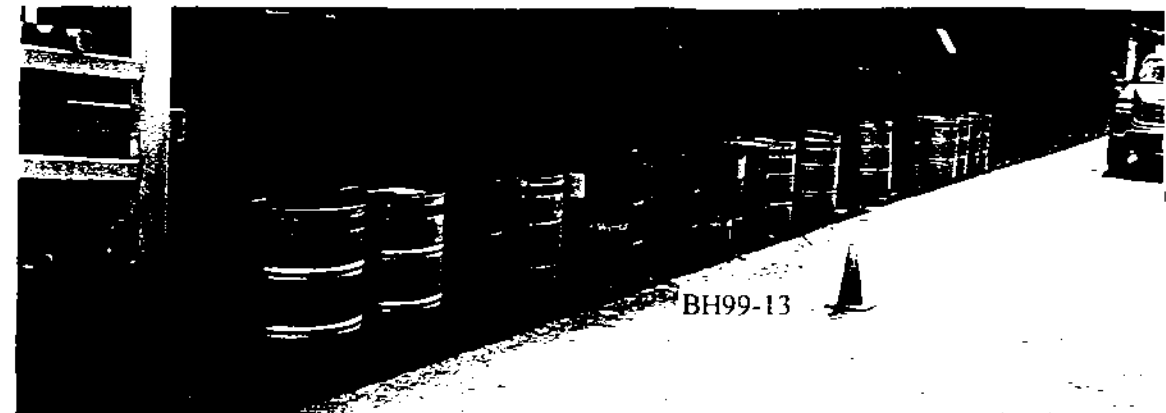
Location of BH99-13 adjacent to surficially stained asphalt and barrel storage area.
